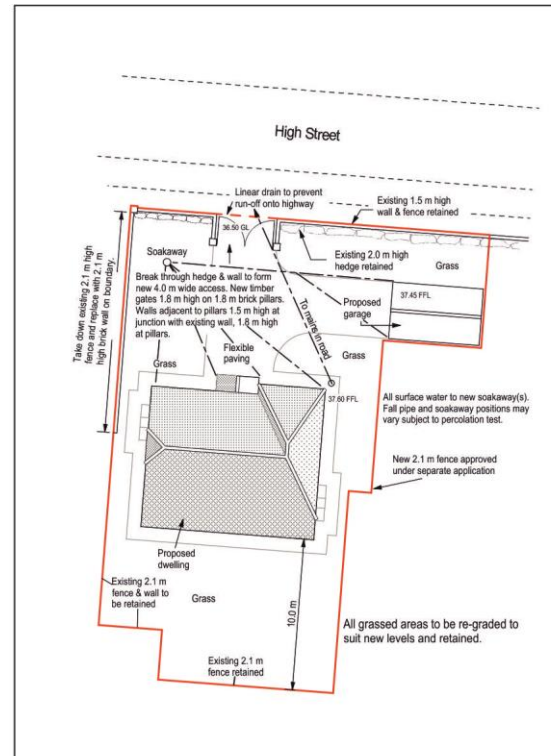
Site layout plan showing position of new bungalow within redline boundary of site.
